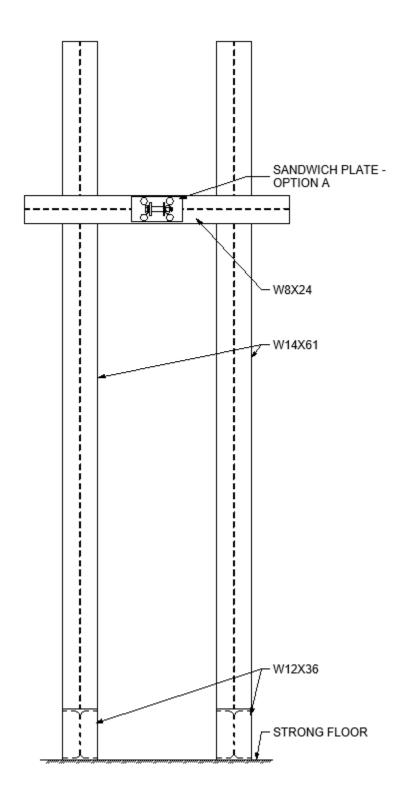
Front Elevation of Reaction Frame. (See Figure 7 for Horizontal Beam.)
